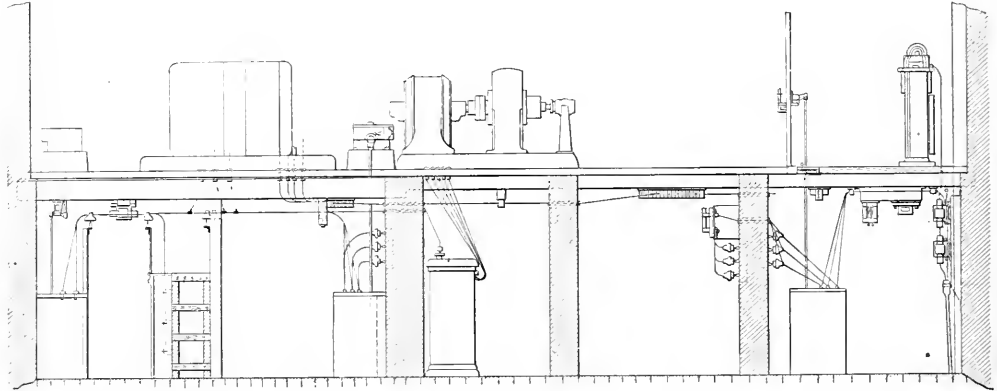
CROSS-SECTION OF LIGHTING END DOCK STREET SUB-STATION, SHOWING WIRING.
